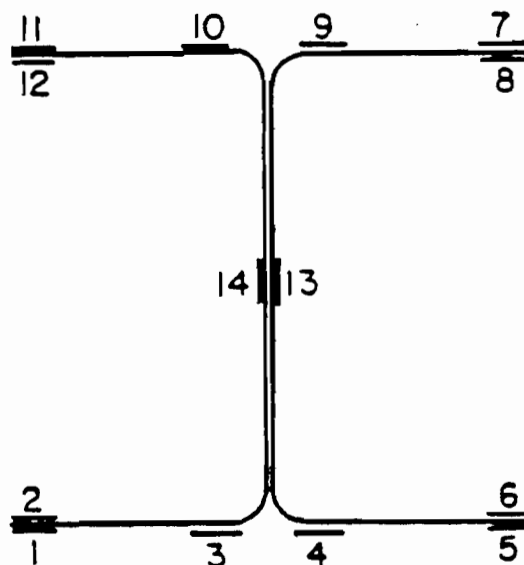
Locations of Strain Gages at Midheight of I-Shaped Stub Columns
